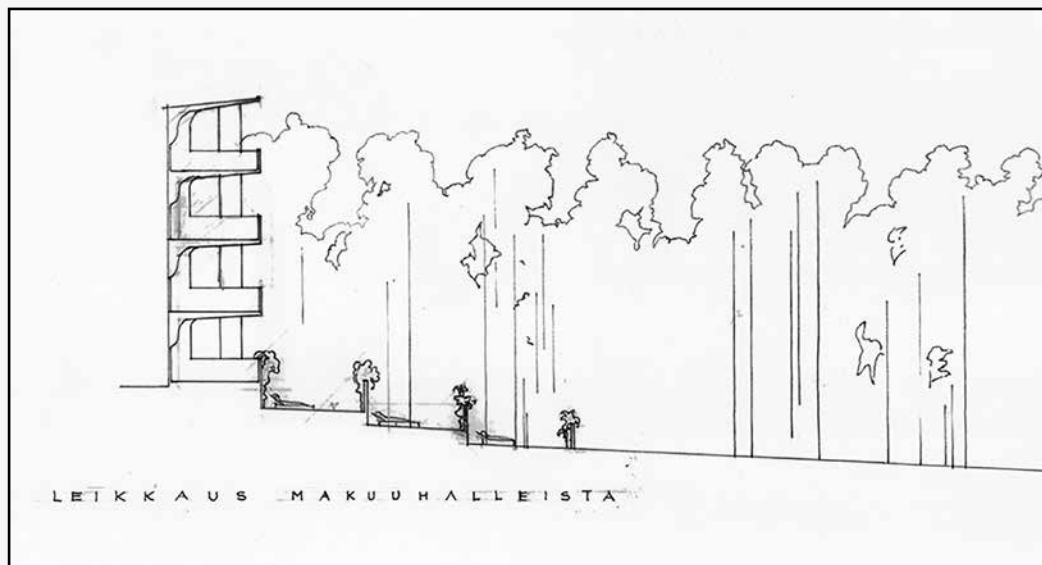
At the competition stage, the sundeck wing had four floors and no roof terrace. The cantilever, pictured, tapered towards the outer edge. The rear wall was load-bearing and it was supported with buttresses. At the competition stage, all wings had a load-bearing column row in the exterior wall. Only the sundeck wing had a cantilevered structure. Pictured also, the terrace garden in front of the sundecks, designed by Alvar Aalto. Drawing No. 50-29, detail. The drawing has been edited AAM.
